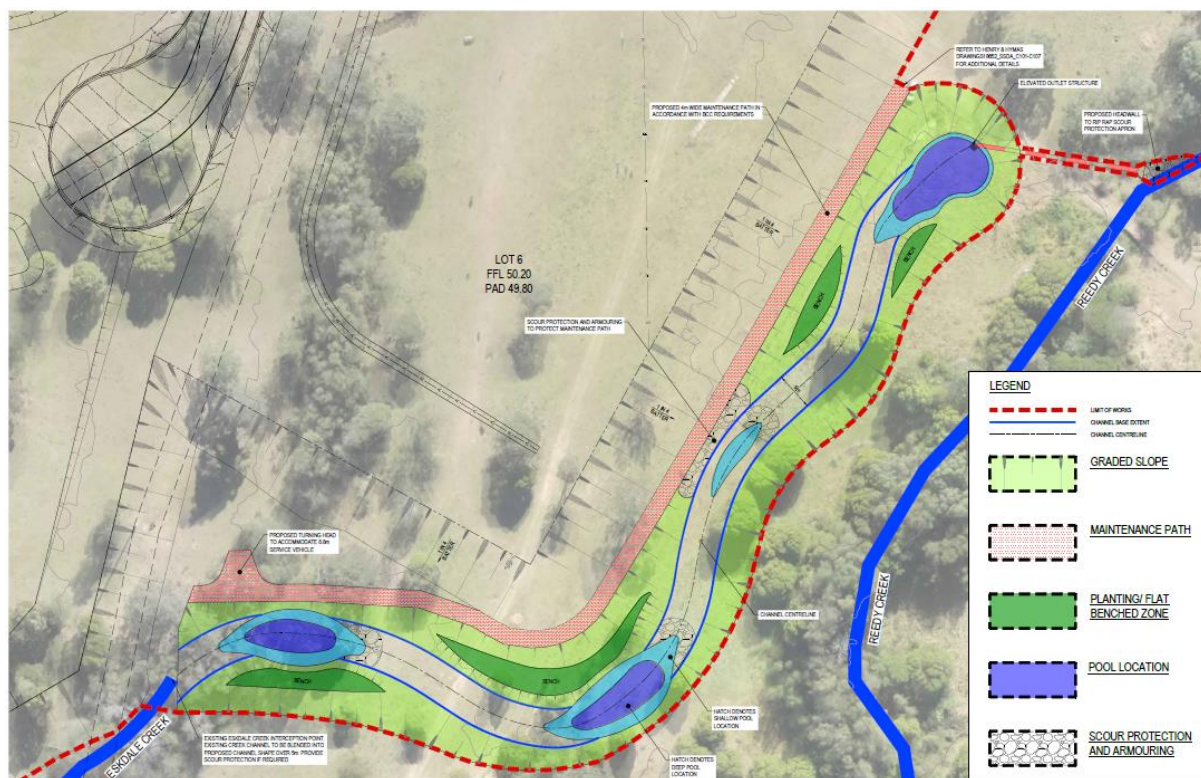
Concept Plan for Proposed Creek Alignment. Enlargement found in Appendix A.
